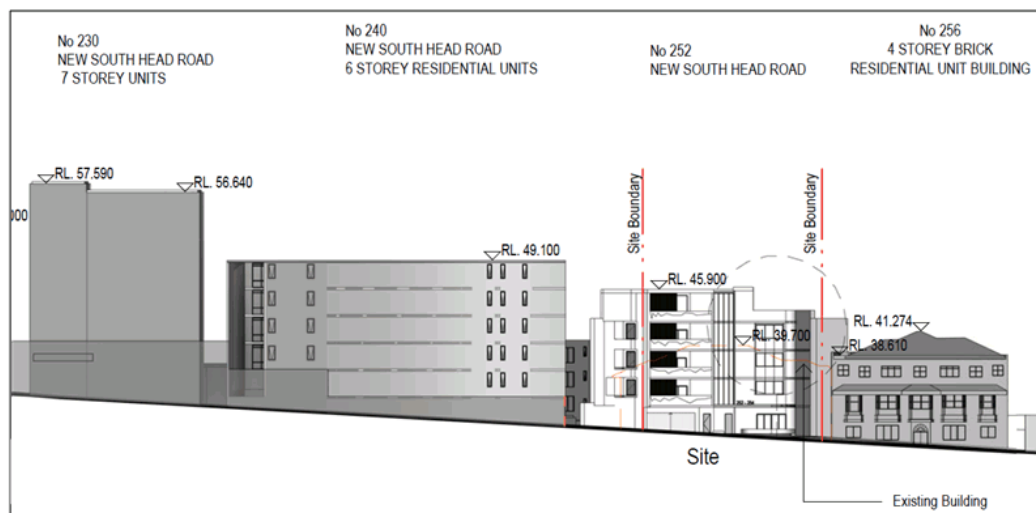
Streetscape Elevation with RL45.90 AHD Height
